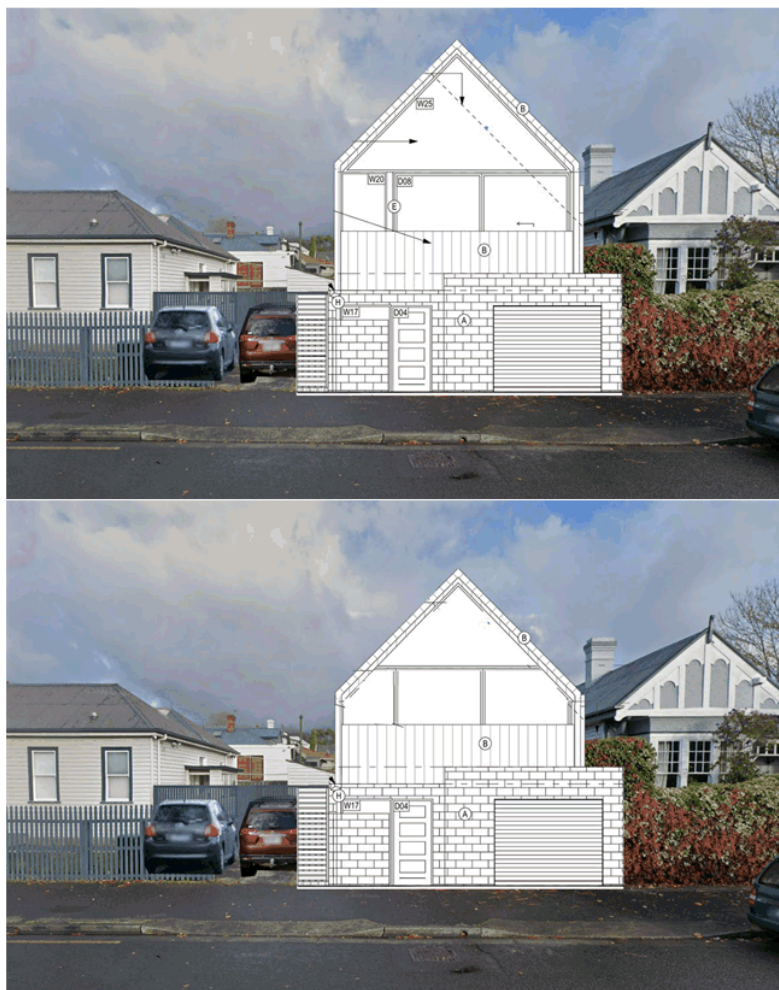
Officer Indicative Illustration based on submitted plans showing proposed and an alternative one and a half design response.
